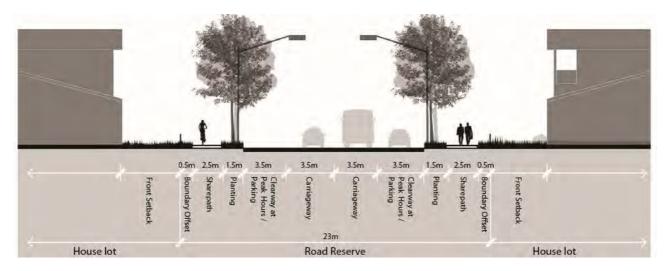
Indicative Rickard Road Transit Boulevard section
